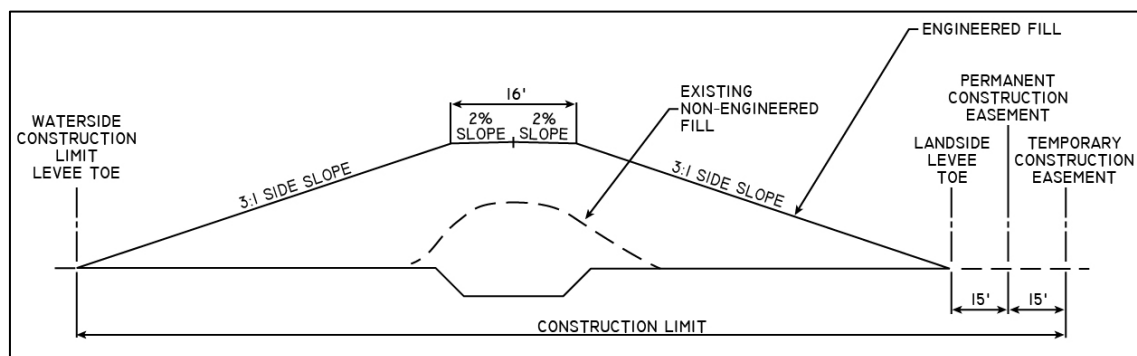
FRM Example Engineered Levee Cross-Section
